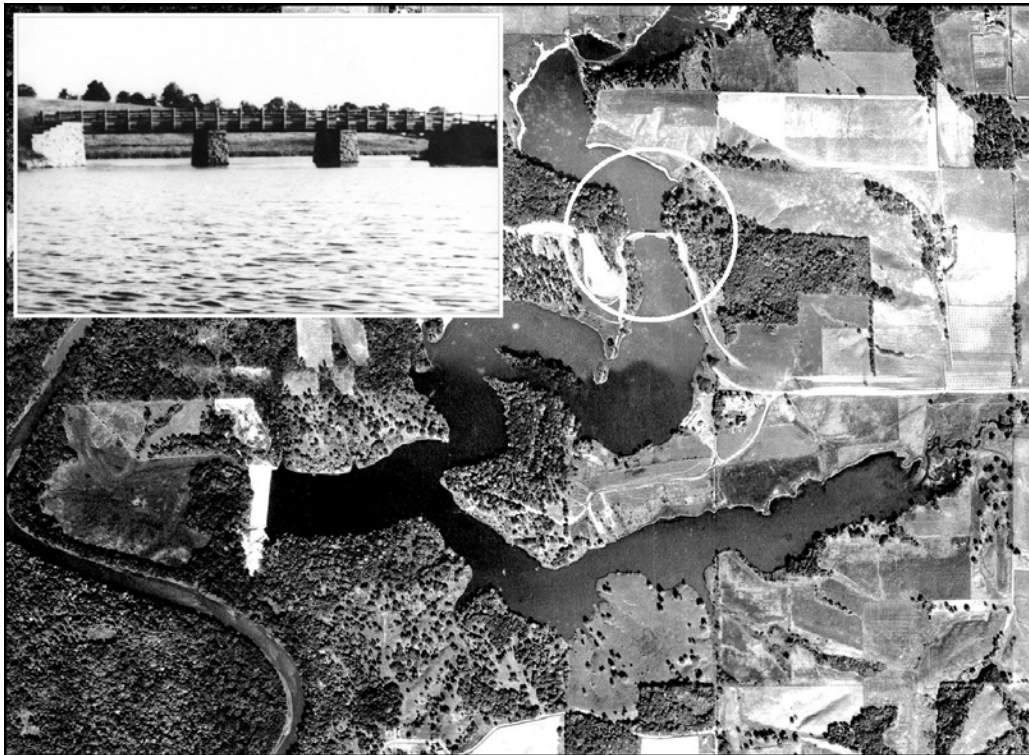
Bridge constructed by the CCC across Mill Creek provided access to Lake Macbride State Park from the east.
